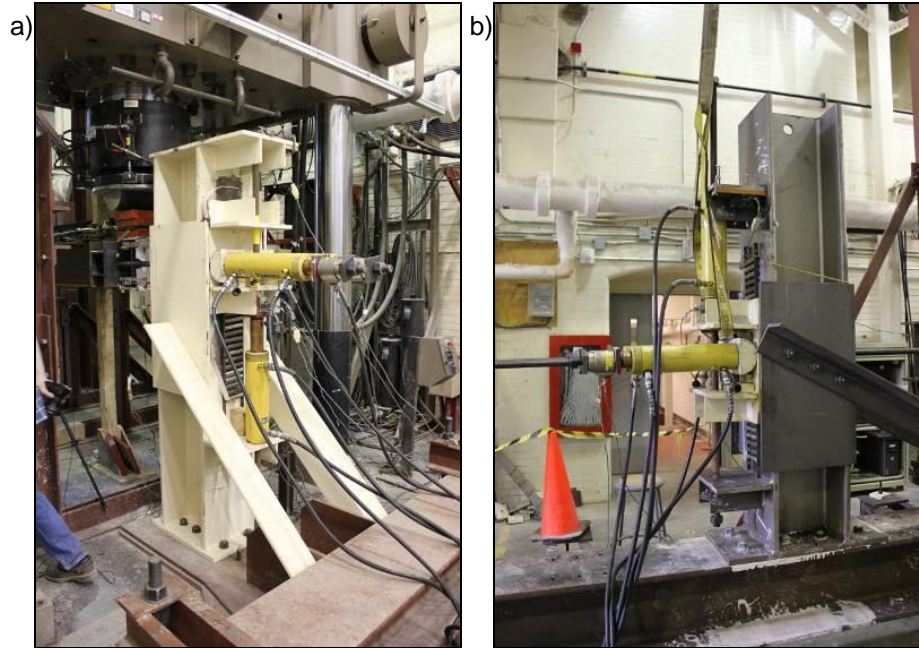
ALAS installation; a) compression tests (Test #1 shown), & b) tension tests (Test #2 shown)
